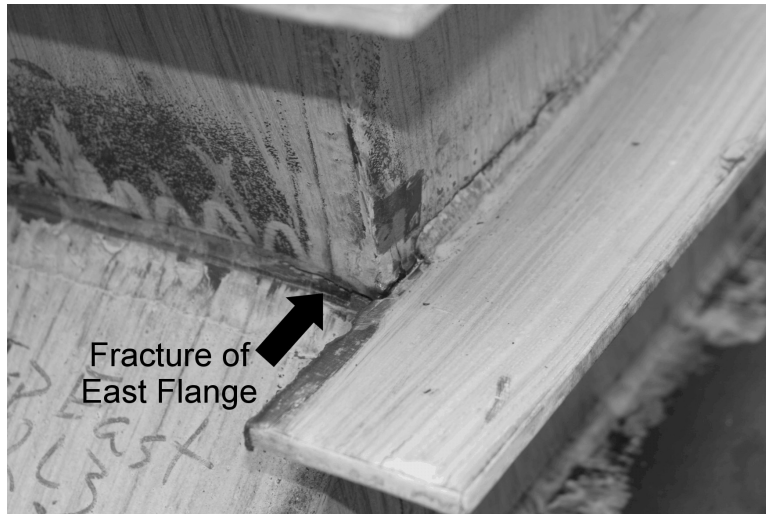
Fracture of Bottom East Flange of Specimen X2L2.1
